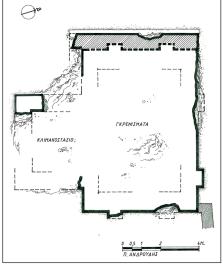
Plan of the tower and its latest adjacent structures (P. Androudis)
